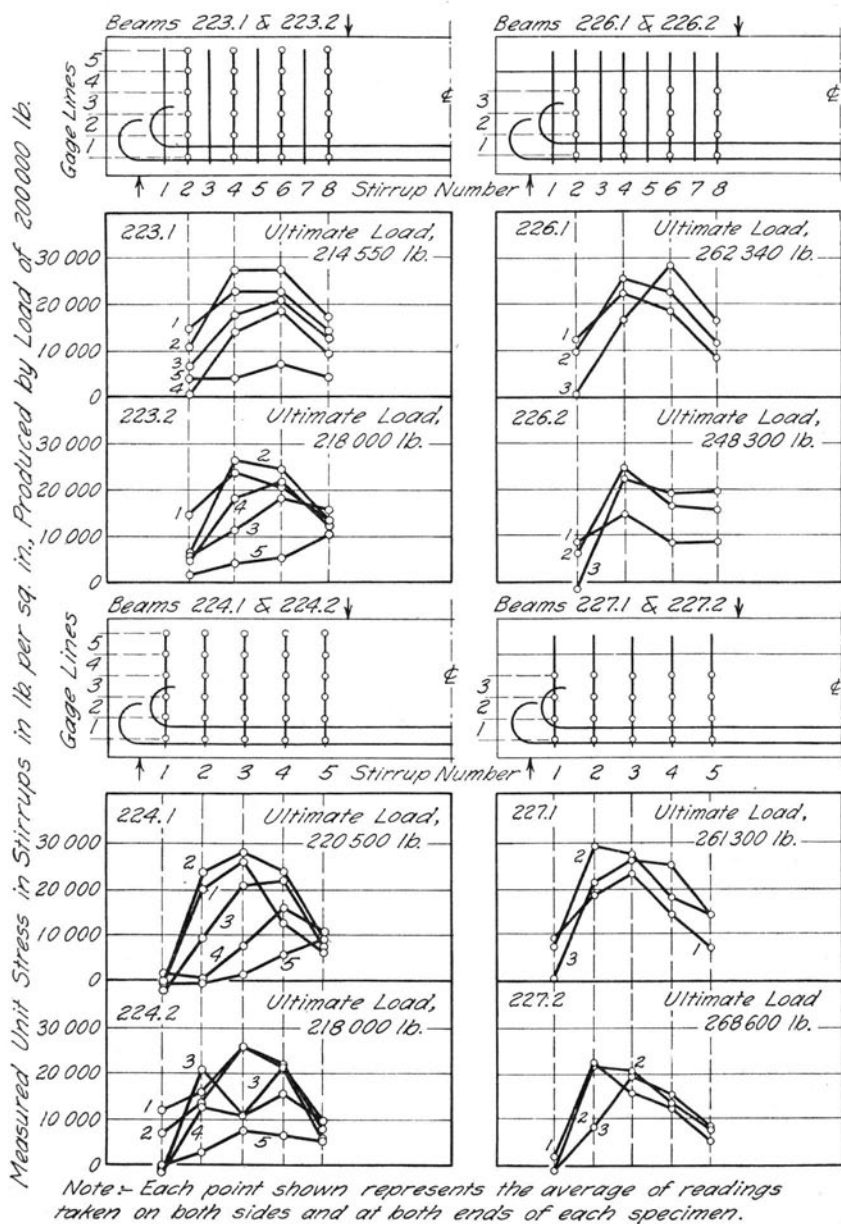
MEASURED STRESSES IN VERTICAL STIRRUPS OF RECTANGULAR BEAMS AND T-BEAMS, SERIES OF 1922
